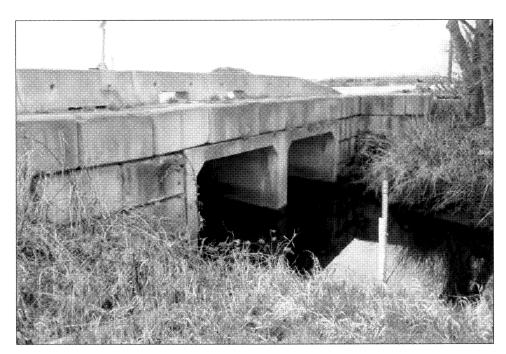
EAST DITCH: Big Slough at Ladner Trunk Road (view facing west)
